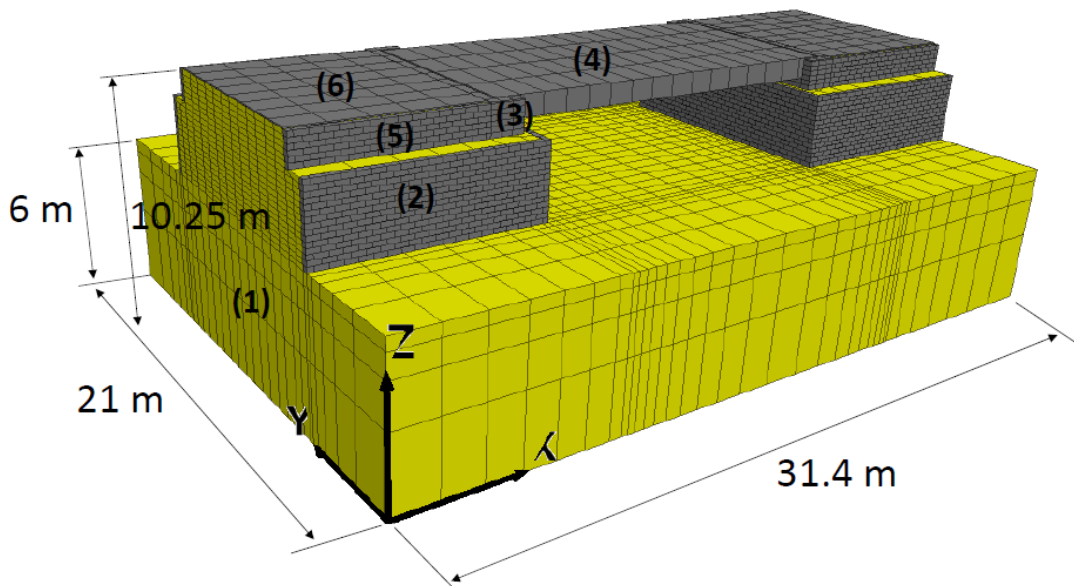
Finite difference model configuration for the GRS bridge abutment (1: foundation soil, 2: lower GRS wall, 3: bridge seat, 4: bridge beam, 5: upper GRS wall, 6: pavement).
